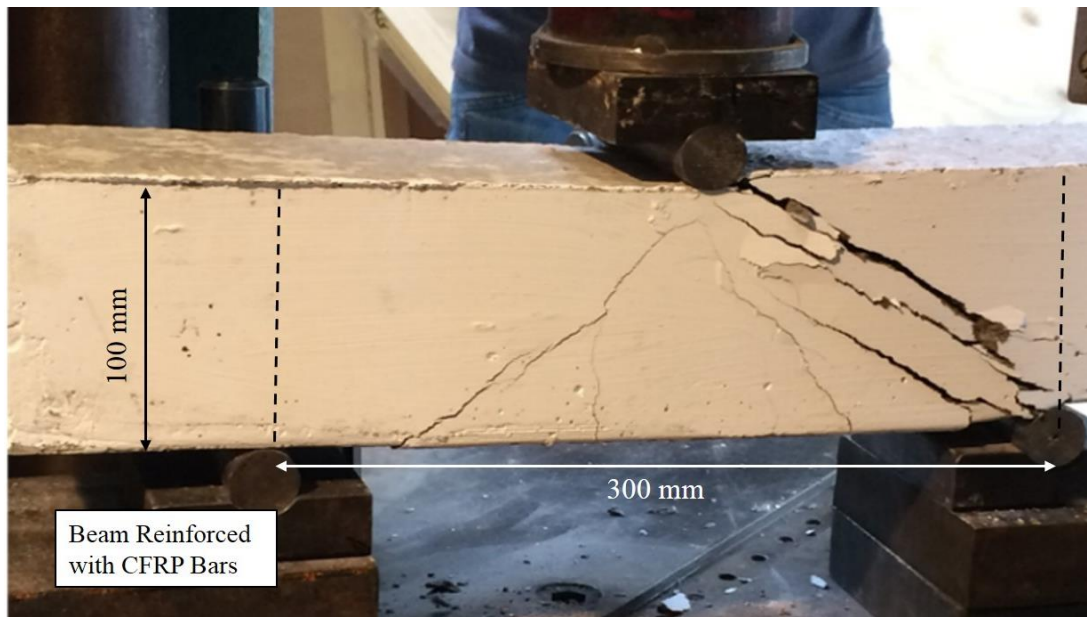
Failure and development of diagonal cracks of the CFRP beam specimen under the three-point bending test
